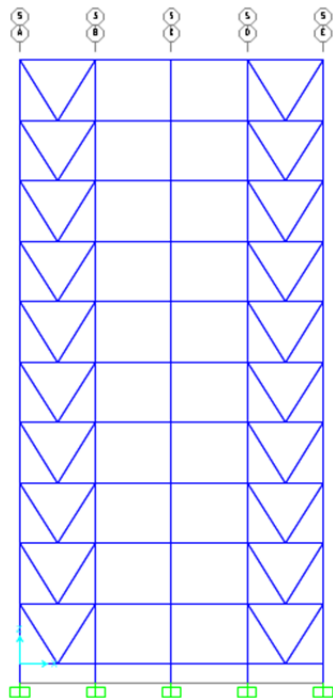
Elevation of Frame in Z direction(vertical) for steel frame with V- Bracing
